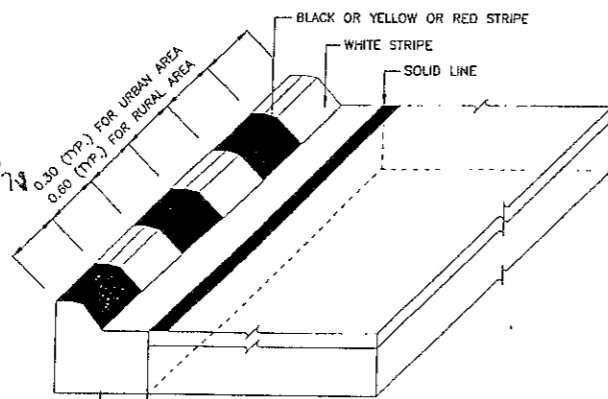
DETAIL OF CURB AND GUTTER OR CURB AT RAISED MEDIAN
